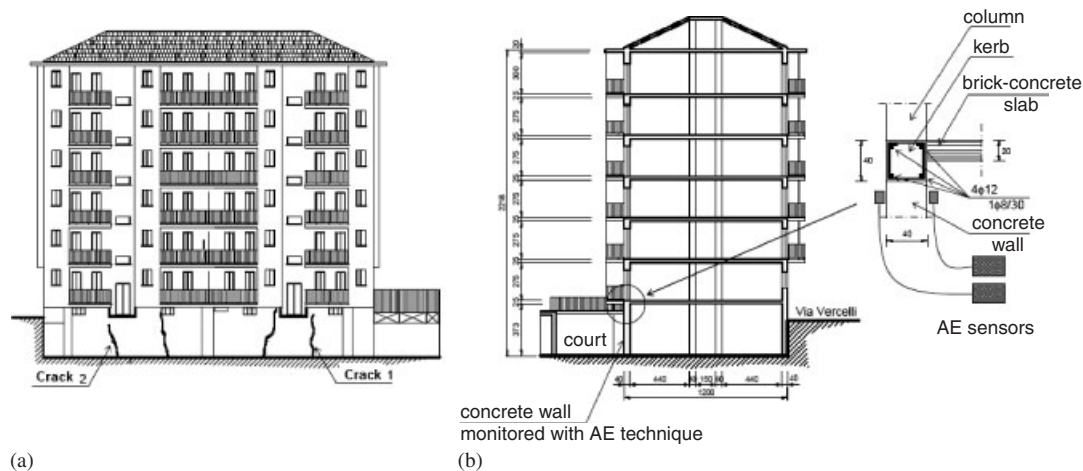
The monitored building: cracks in the concrete wall (a) and cross-sectional view (b).
